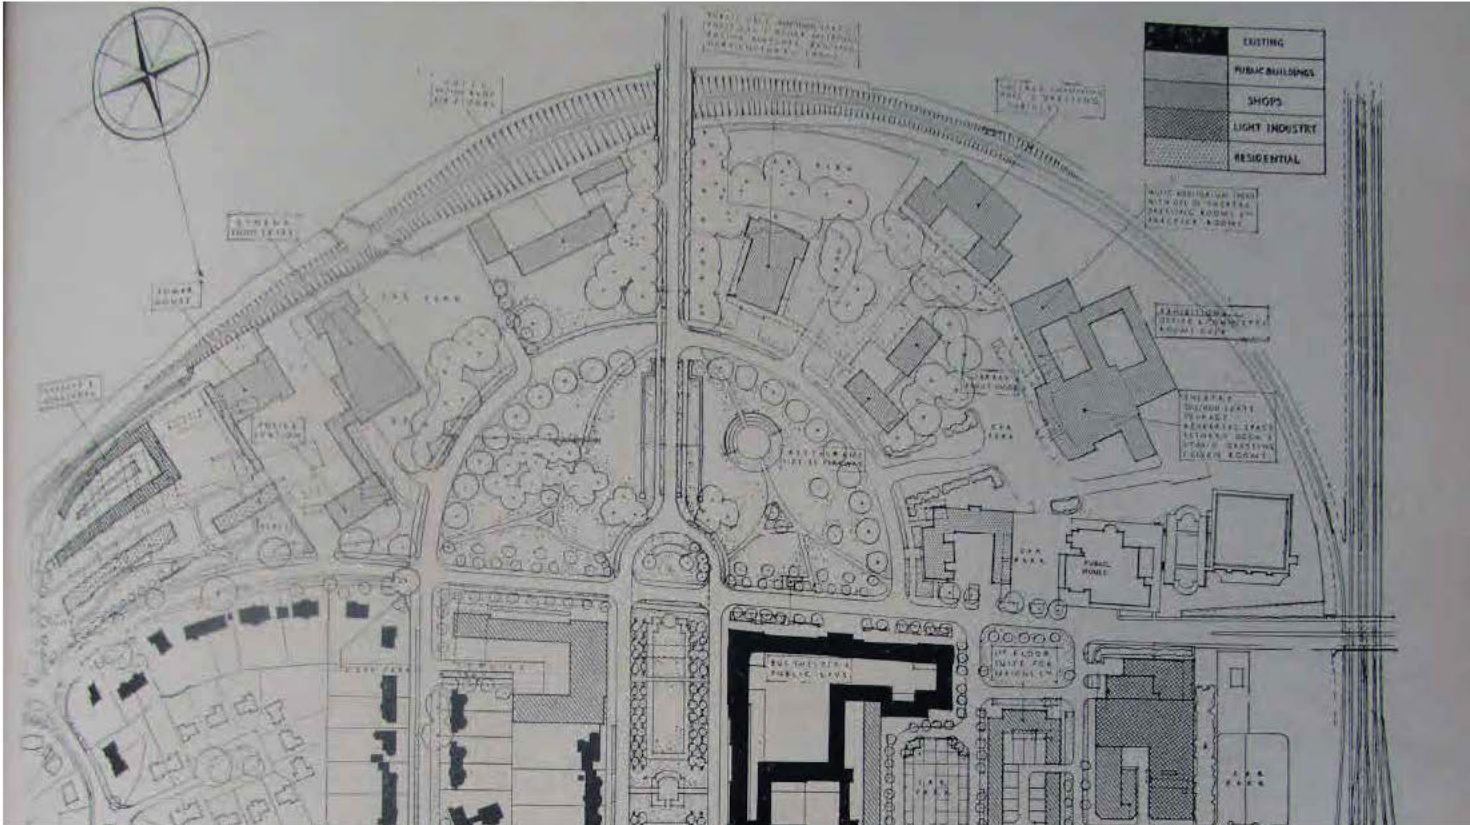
1951: Proposed development plan for the Town Centre . Note the road around the exedra was not proposed to be linked to the main north-south Digswell Road.
